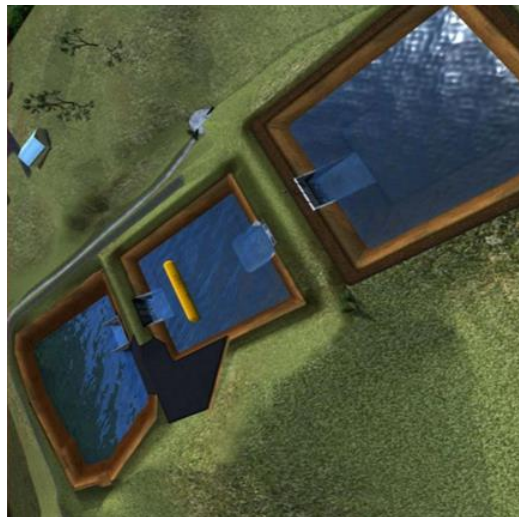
USACE ERDC CHL Levee Breach and Hydraulic Facility [54]
